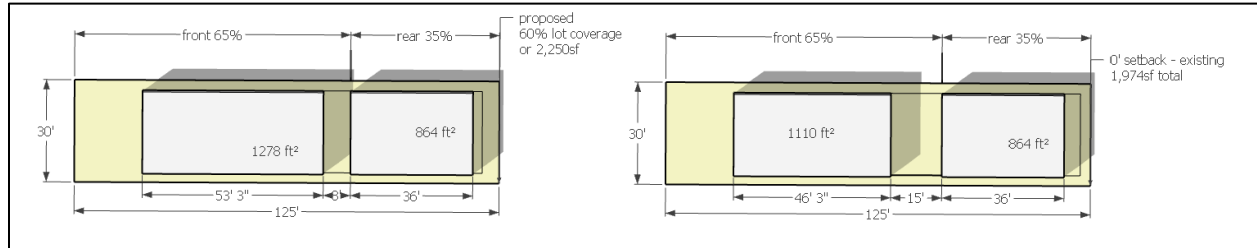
Comparison between proposed (left) and existing (right) allowed building coverage on 30'x125' zone lot.
